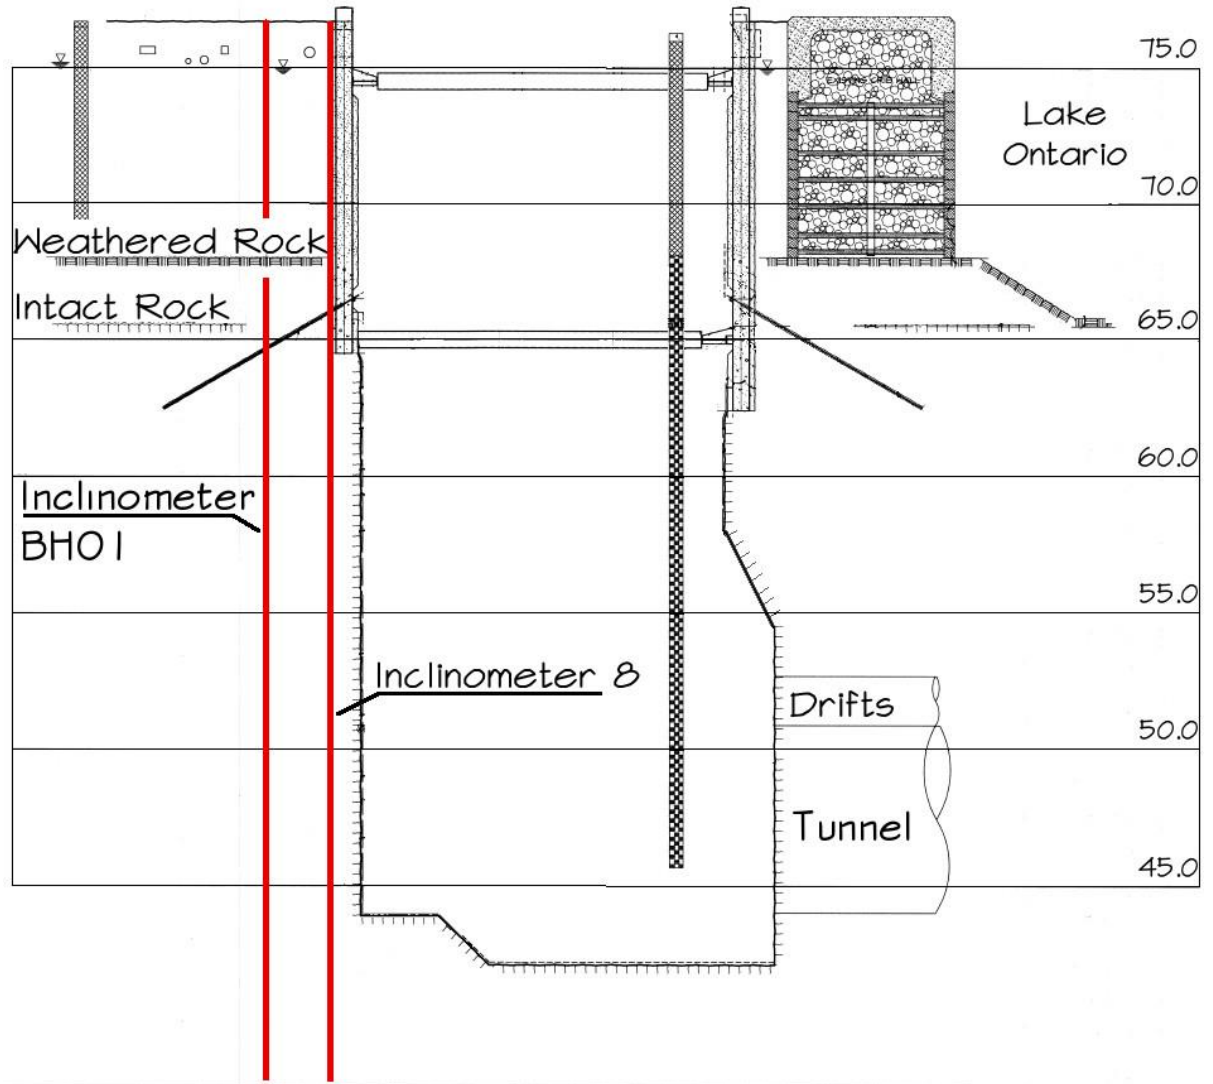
Billy Bishop Pedestrian Tunnel mainland shaft section (Elevations in m).
